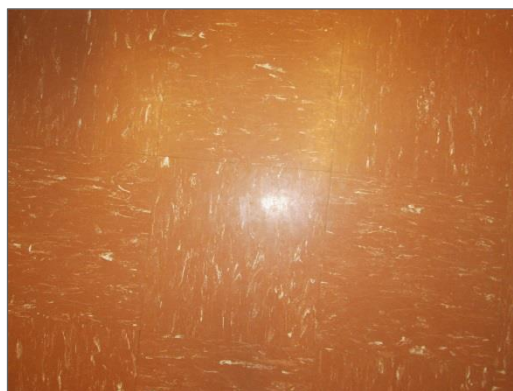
Asbestos-containing 12" x 12" red and white streak floor tile.
